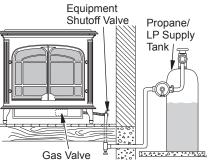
Checking Gas Joints for Propane/LP Gas Burner System
